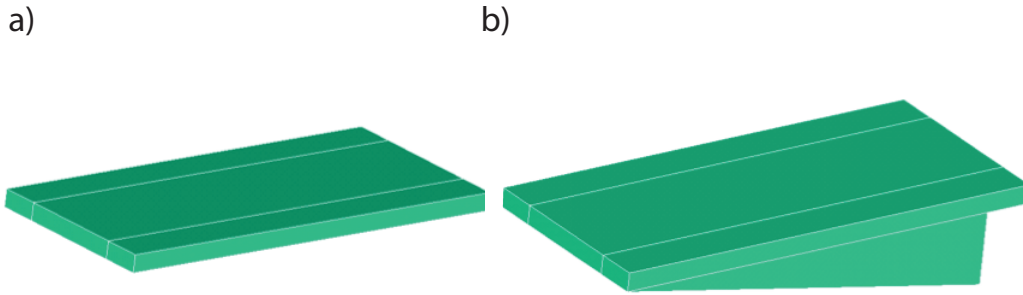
Geometry of two proposed approach slabs: a) rectangular slab, and b) inclined slab
